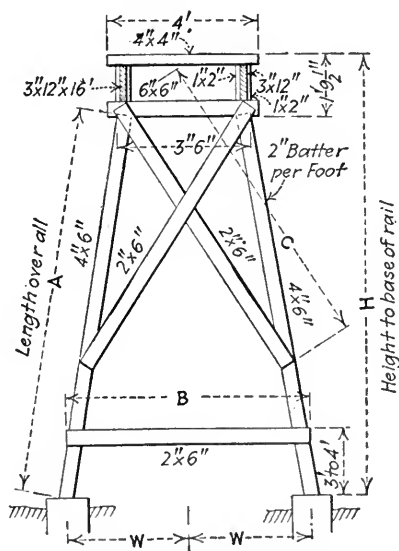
BENT, SHOWING CONSTANT AND VARIABLE DIMENSIONS.
